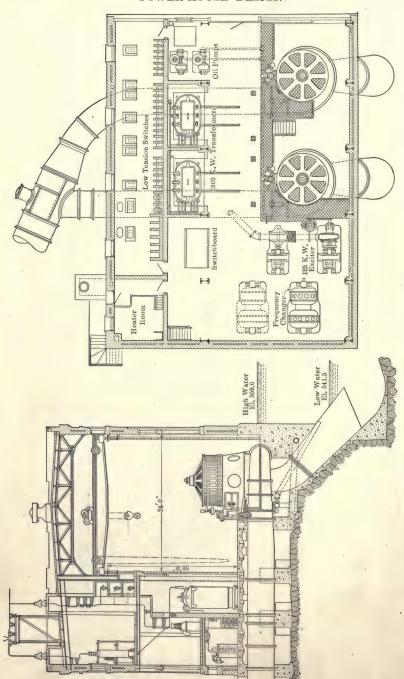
A.—Floor Plan of Power-house, Montana Power Company, Rainbow Falls Development. (For cross-section see Fig. 99.
